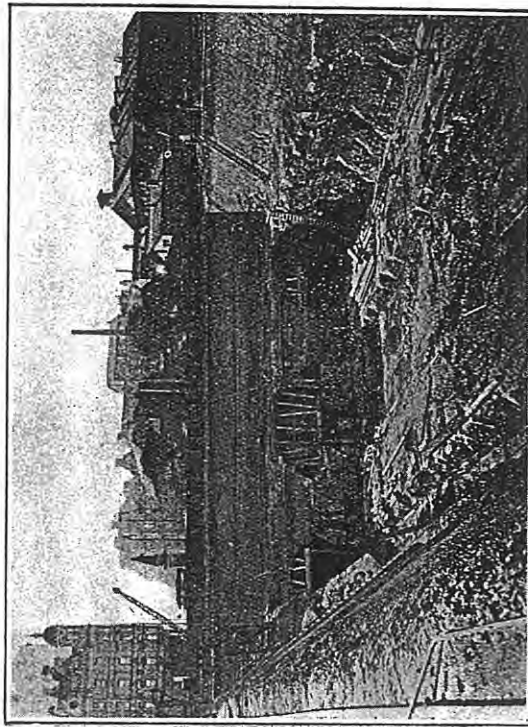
Open Cut for St. James Station, looking North. Showing Tunnels under Macquarie Street.
